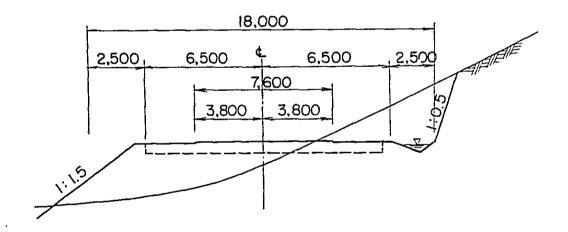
STANDARD CROSS SECTION OF APPROACH FEEDER ROAD
